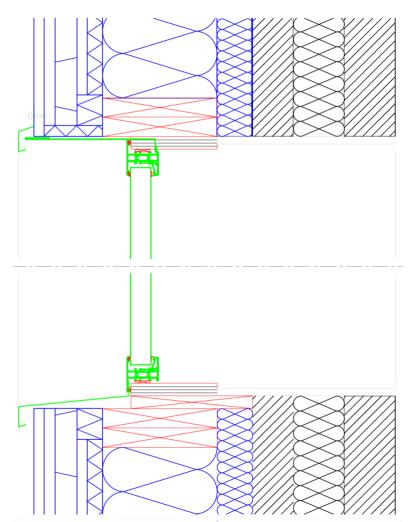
Detail drawing of the window location in the prefabricated Alingsås facade element.
